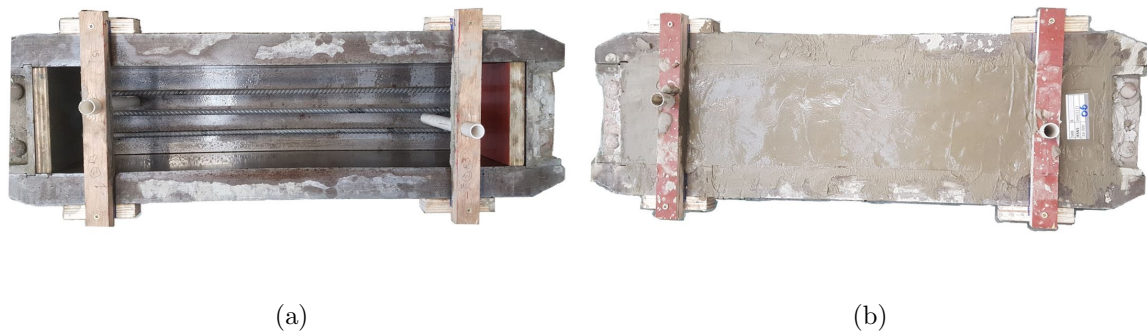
(a) Specimen mould prior to, and (b) after casting
